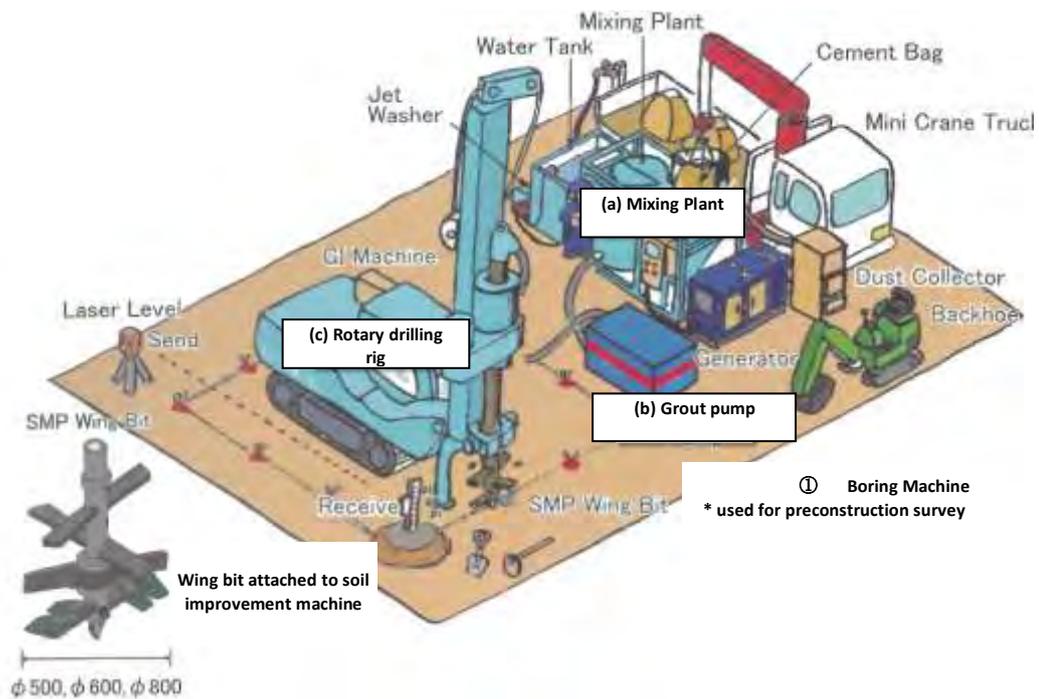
A complete set of machinery for the Middle layer Mixing Method
